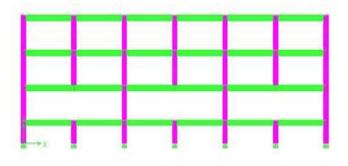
Elevation view of G+3 building with floating columns at interior frame
